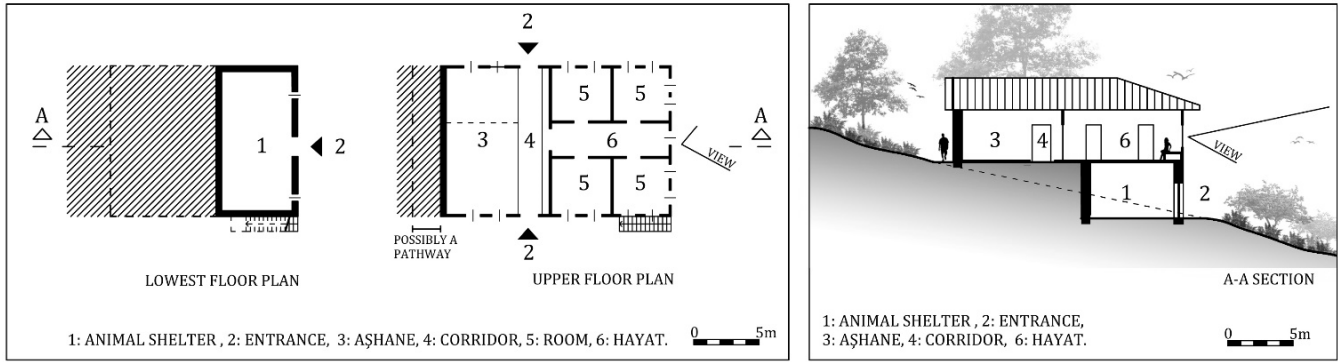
General layout of the vernacular houses and the typical section (Var, 2018).
